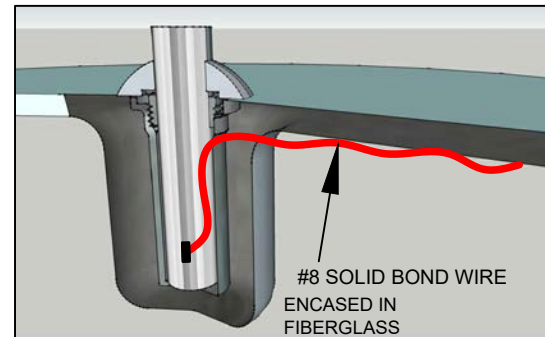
DETAIL REFLECTS ANCHOR INSTALLATION IN NESPA SHELLS ONLY.
